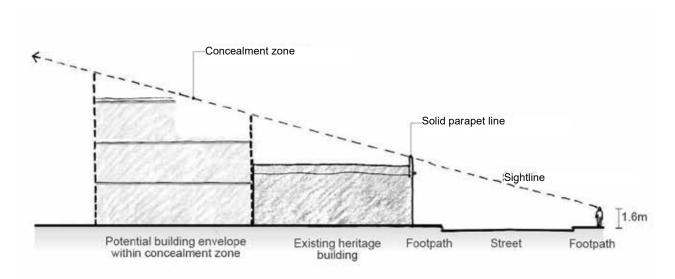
Sightline to achieve full concealment behind a Significant building or to any single-storey building in a consistent streetscape.
